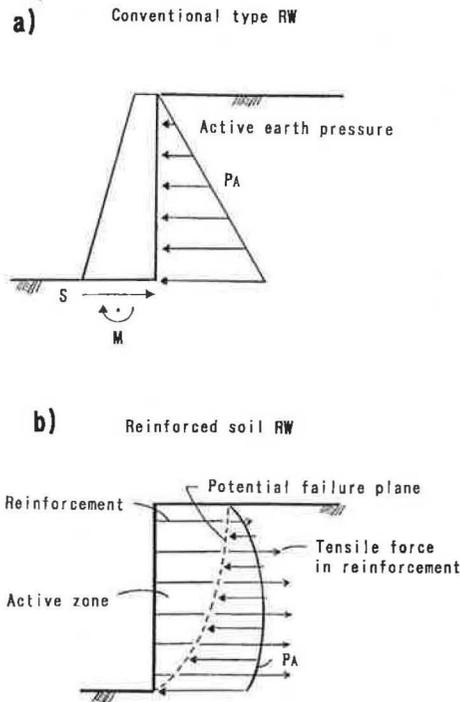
Force equilibrium for; a) a conventional type retaining wall, and b) a reinforced soil retaining wall
